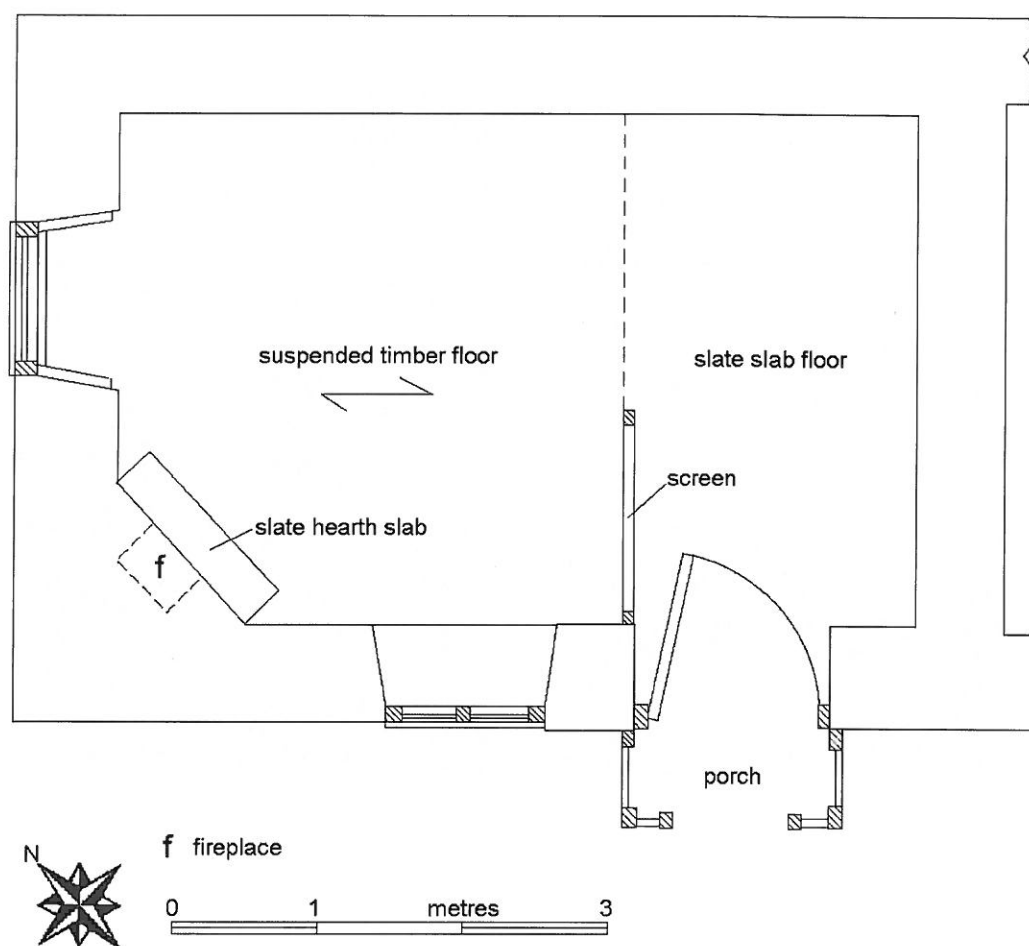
Plas Smart, floor plan (*scale 1:50*)
